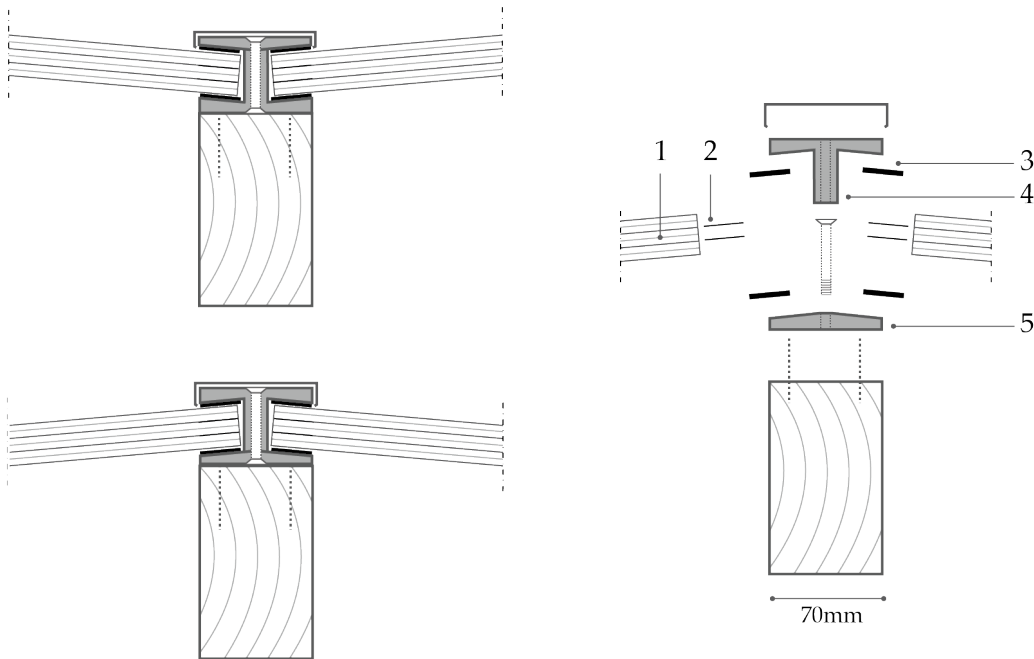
Section of the glass clamps, and exploded view [scale 1:5]
